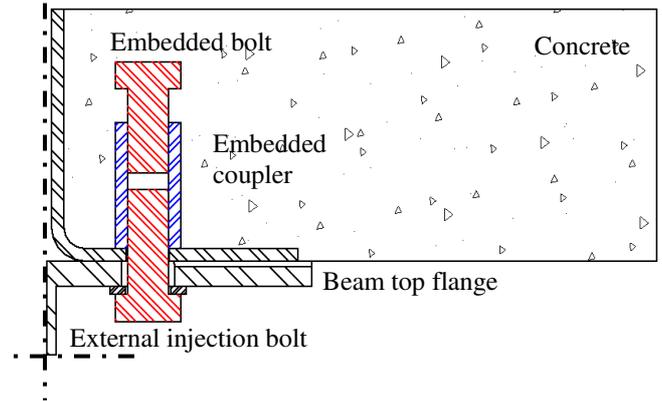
Demountable shear connection system, concrete height 120 mm and top cover 25 mm
